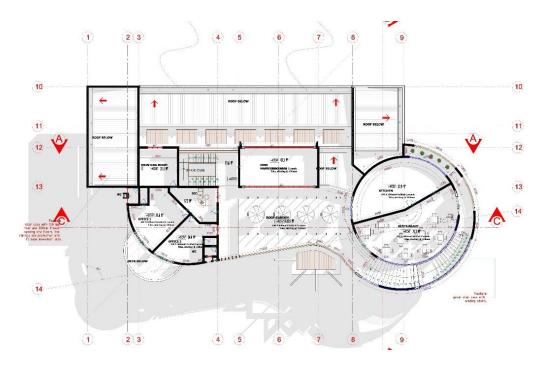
An architectural illustration showing the first floor plan. Source: Author's field work (2023)
